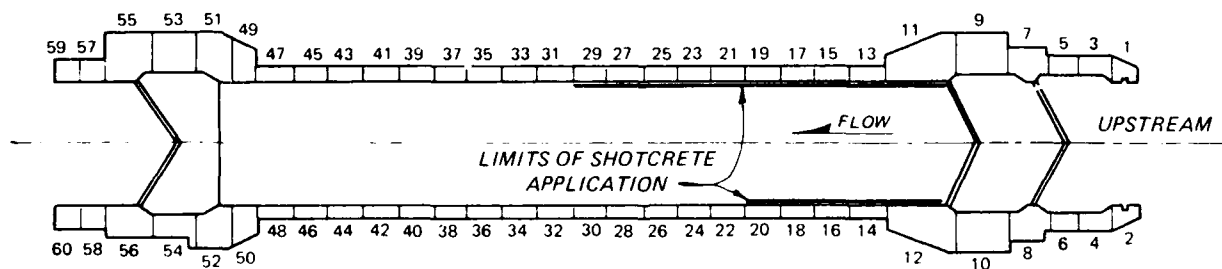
Wall monoliths that were refaced with shotcrete, 1954, Dresden Island Lock
